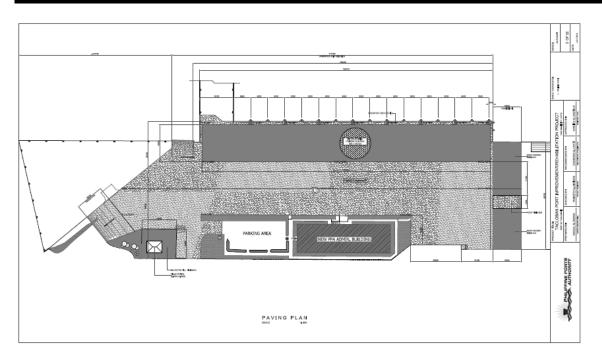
Paving Plan of Steel Pipe Sheet Pile Berth
